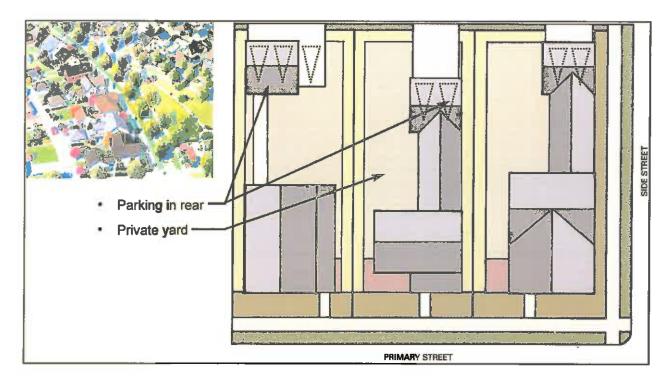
Alley-loaded lot plan and aerial views. Figure Deleted
